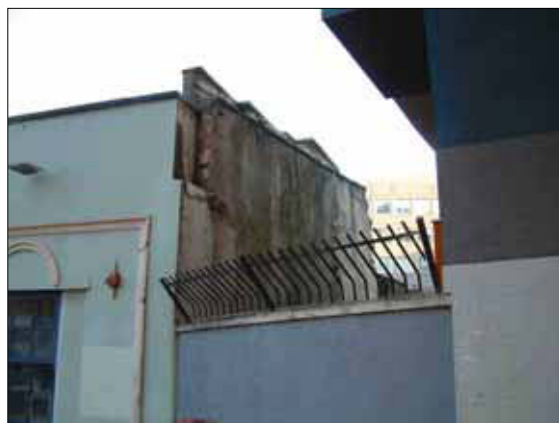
view of the southwest end of the Attic Bar and Nightclub showing the peaked upper edge of the higher, earlier section of parapet wall preserving in profile the apex of adjacent former pitched roof structures, looking north from North Street
